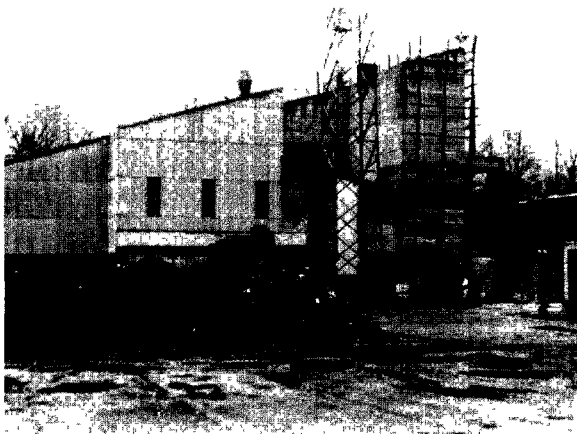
Composting plant at Buchs, Switzerland. A new incinerator building is being constructed adjacent to the compost building.
